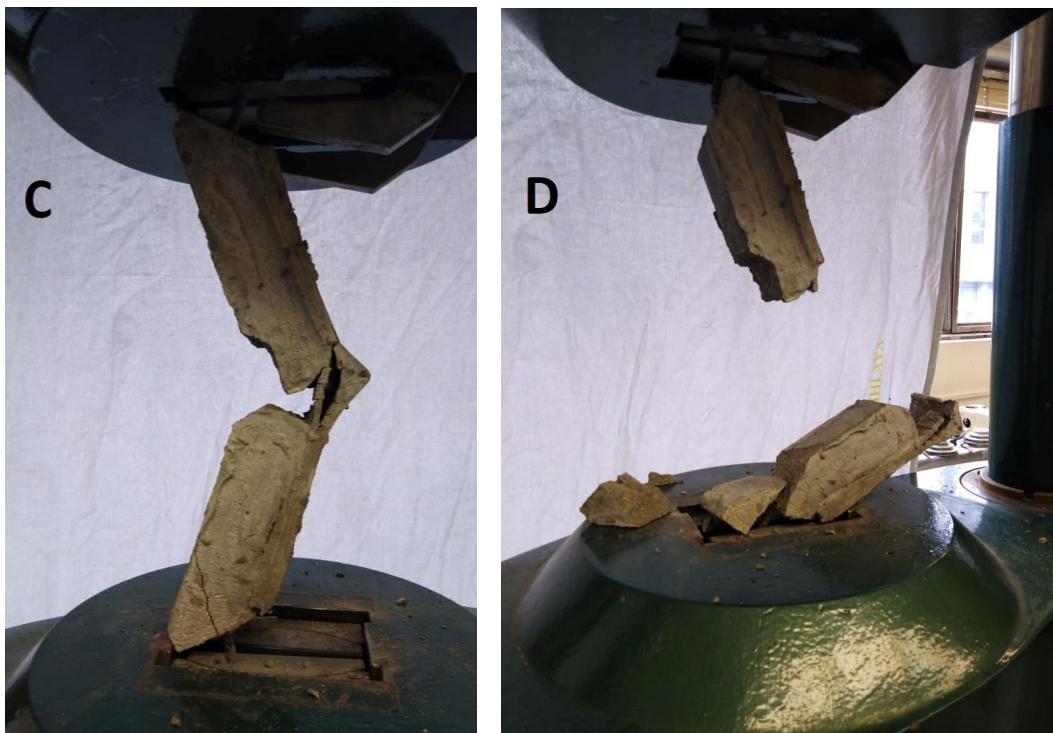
Failure of TRC specimen under tension. Source: Author)
